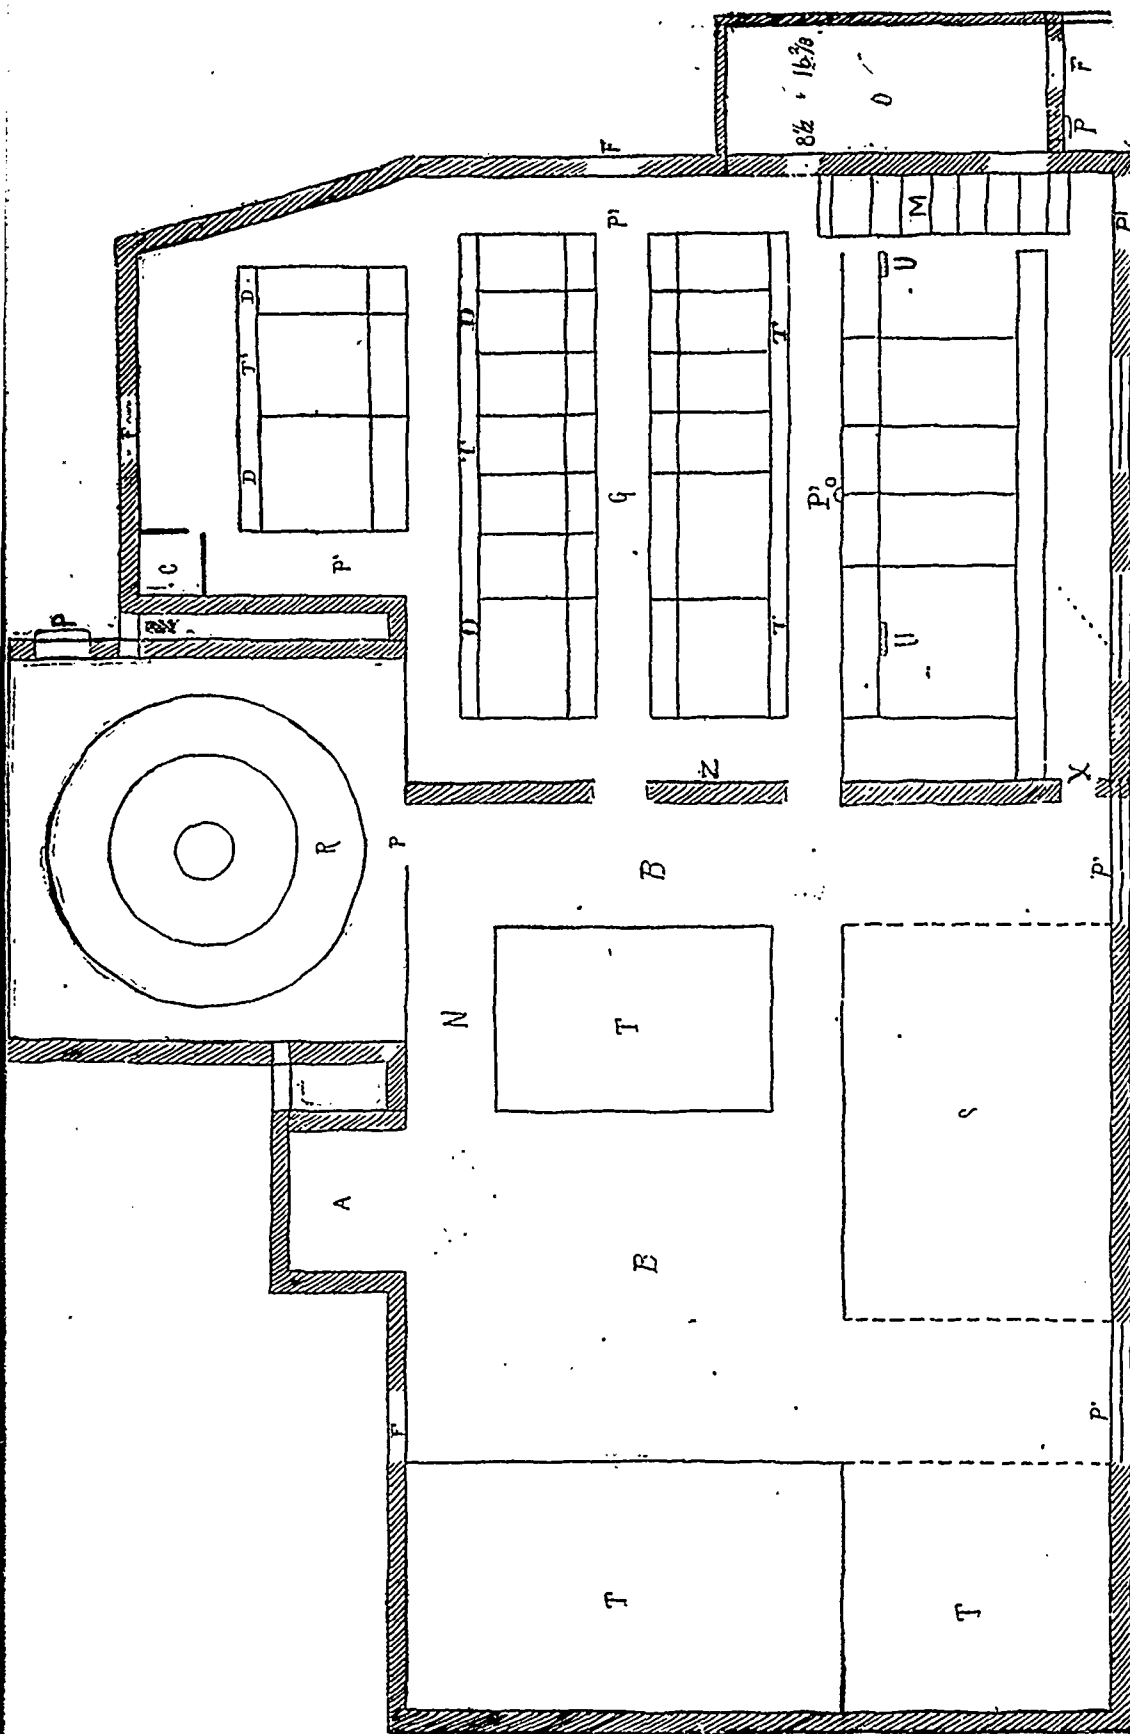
Plate VI.—Building of M.M. Paquet, St. Nicolas, Q., (continued).—Ground plan.
